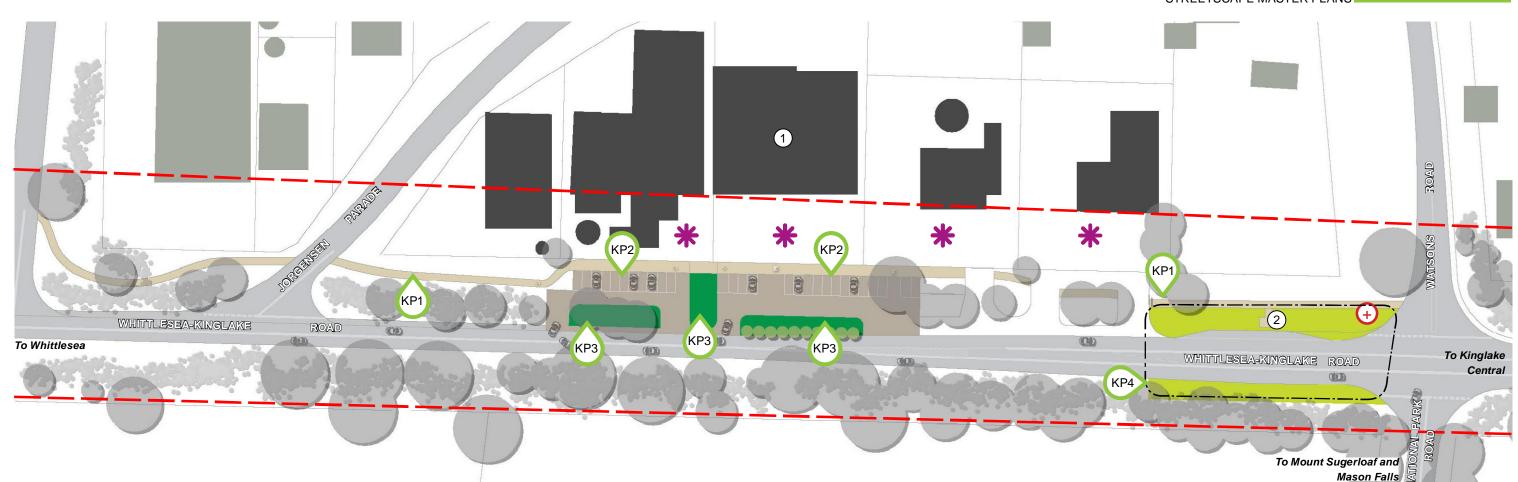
Kinglake West - Pheasant Creek proposed streetscape master plan
